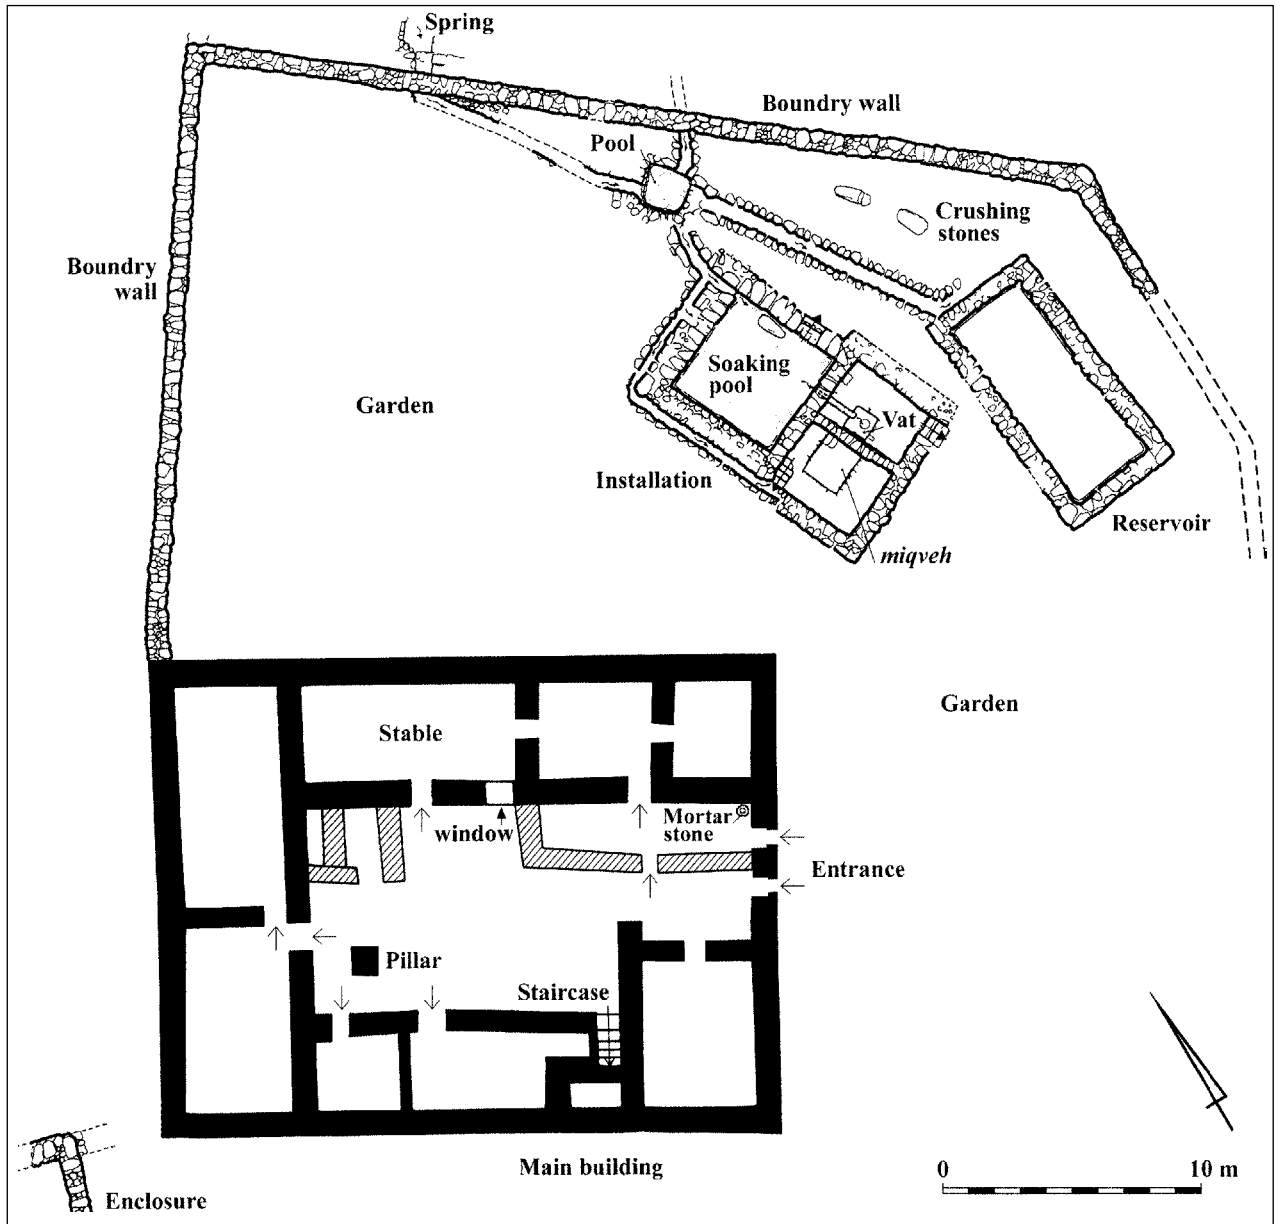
Plan of the farmhouse and industrial installation at 'Ain Feshkha.
